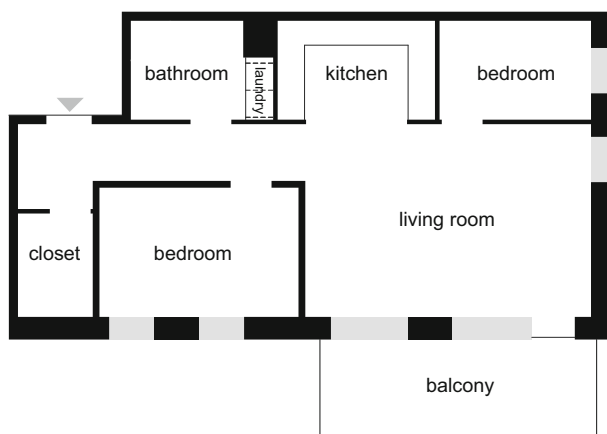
Layout of a three-room apartment, 78 m², built by one of the private build-for-sale companies
